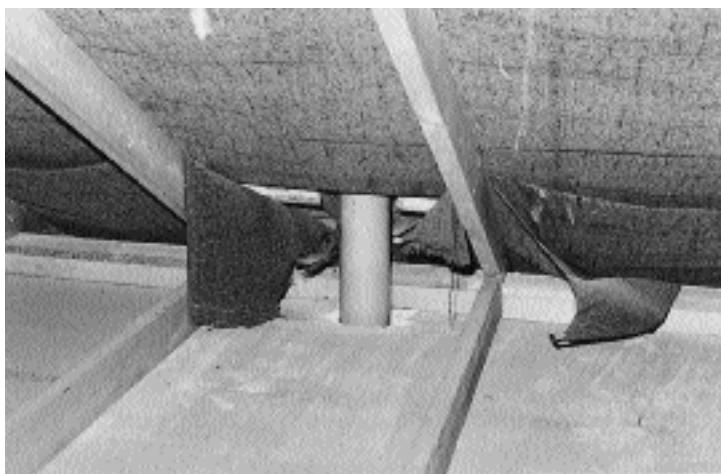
Torn sarking around a soil and vent pipe. If this had occurred underneath the example in Figure 5.83, it would have leaked immediately
